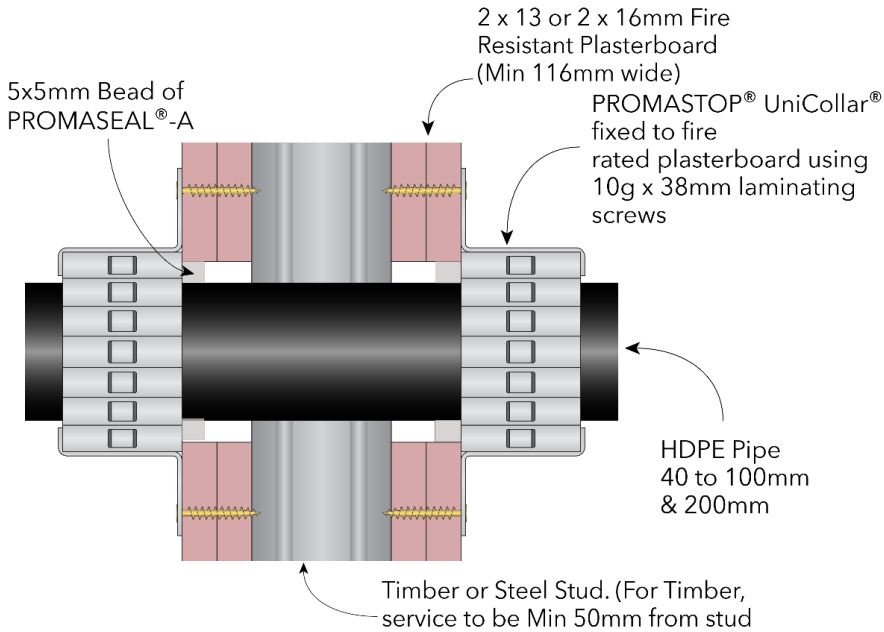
Cross sectional view of HDPE pipe penetrating plasterboard wall protected by PROMASTOP® UniCollar® on either side.
